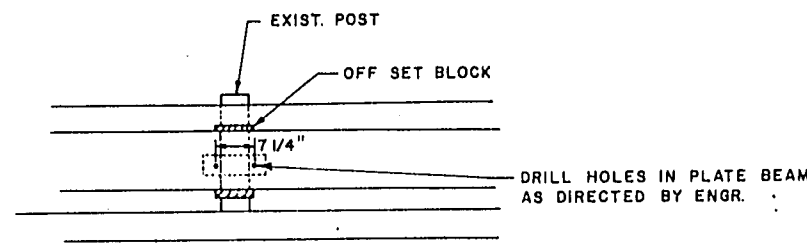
DETAIL FOR ATTACHING BEAM GUARD TO EXISTING RAILING ON STRUCTURES
